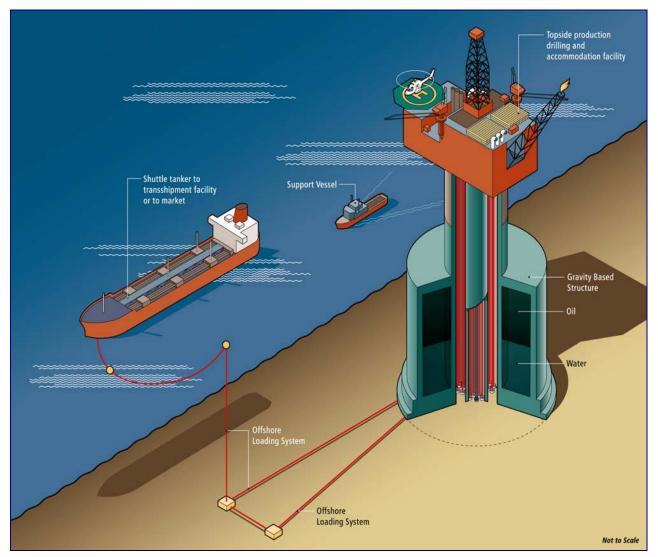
Stand-alone Gravity-Base Structure Preliminary Development Layout
